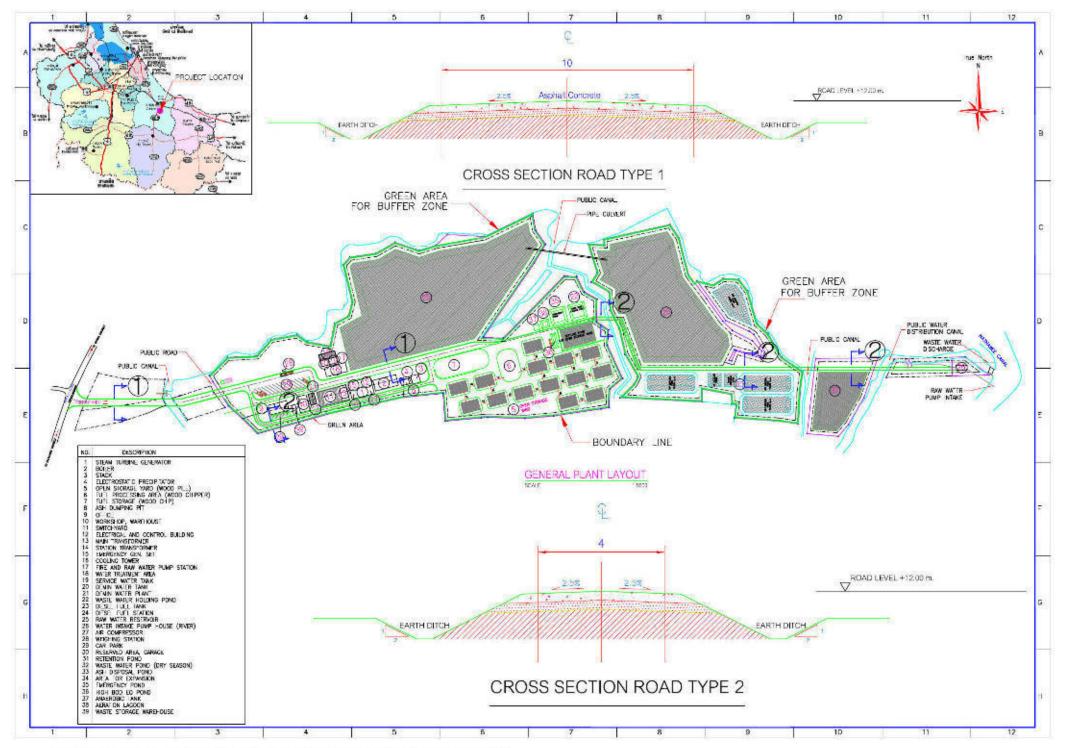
,2,2-2 CROSS SECTION ROAD WITHIN THE PROJECT AREA
